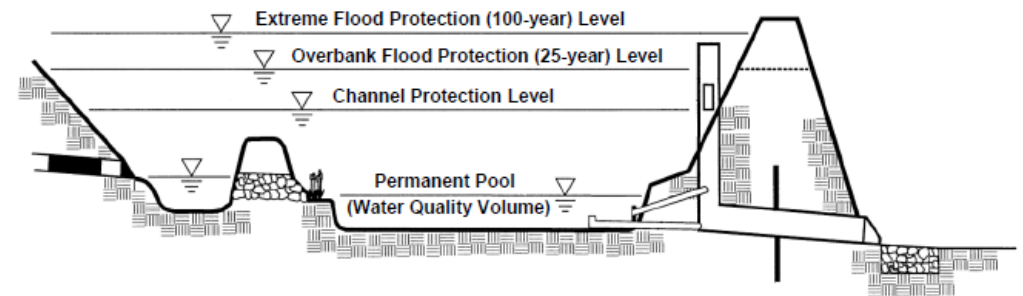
Unified Sizing Criteria Water Surface Elevations in a Stormwater (Wet) Pond
